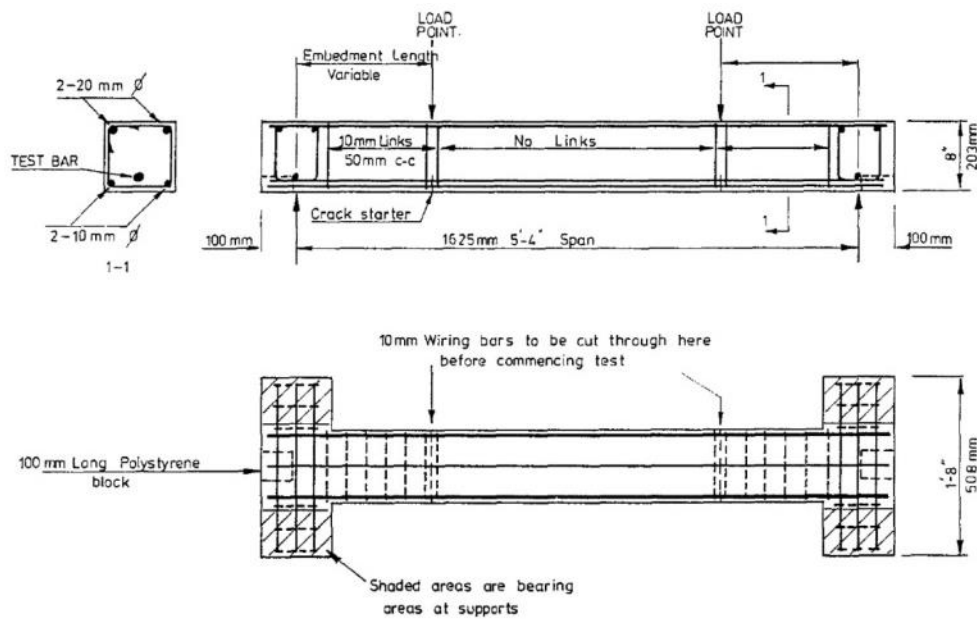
Modification of American type of bond test beam (Roberts, 1973)
